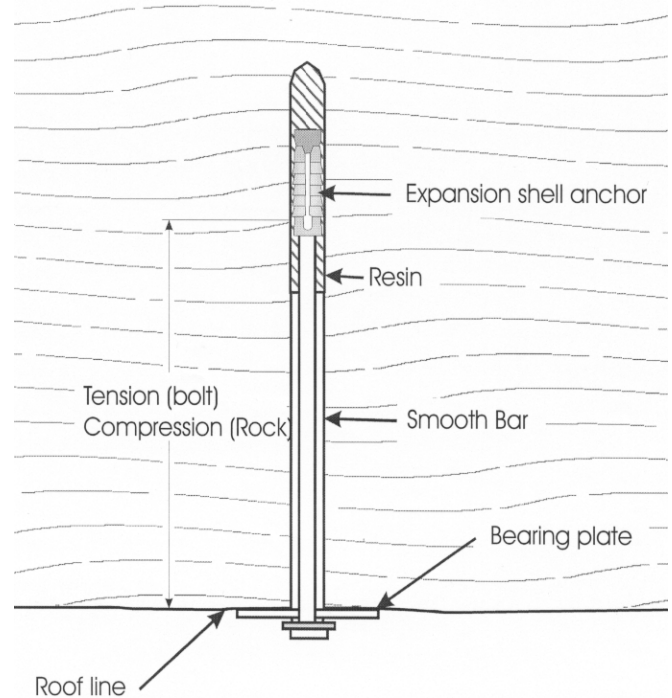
Resin-assisted mechanism anchor bolt installed in roof.
